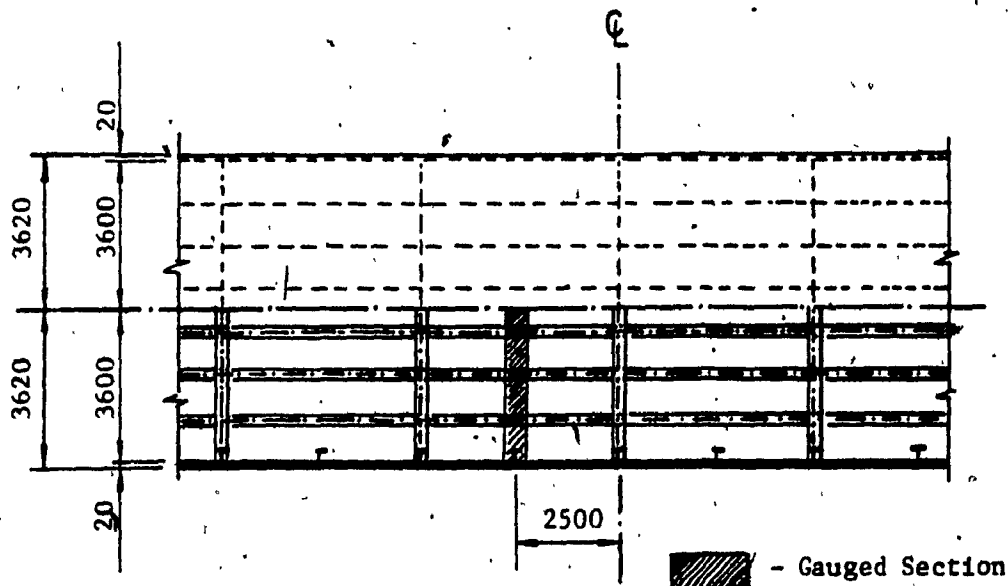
Hunt Club - Rideau Bridge - Girder C1.
